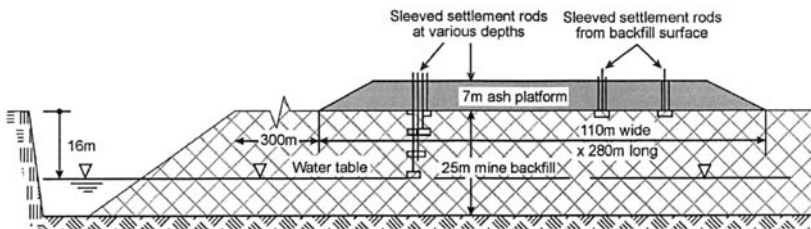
Layout of 7 m hydraulic fill ash platform placed on mine backfill at Kriel Colliery, South Africa.
